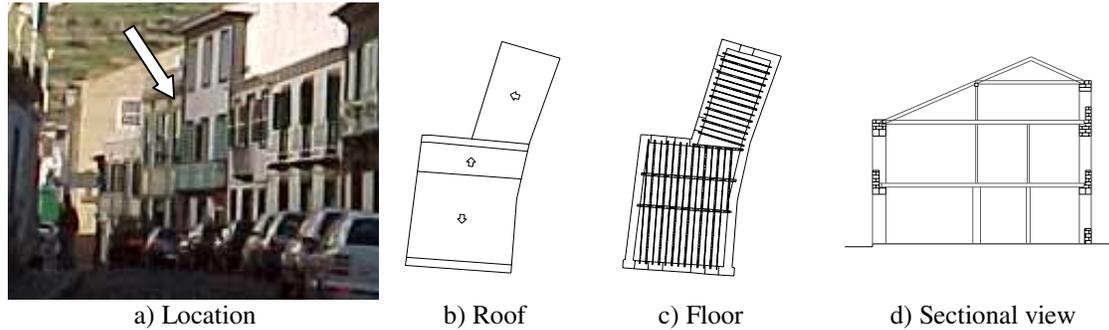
Comendador Ernesto Rebelo Street – house no. 15
